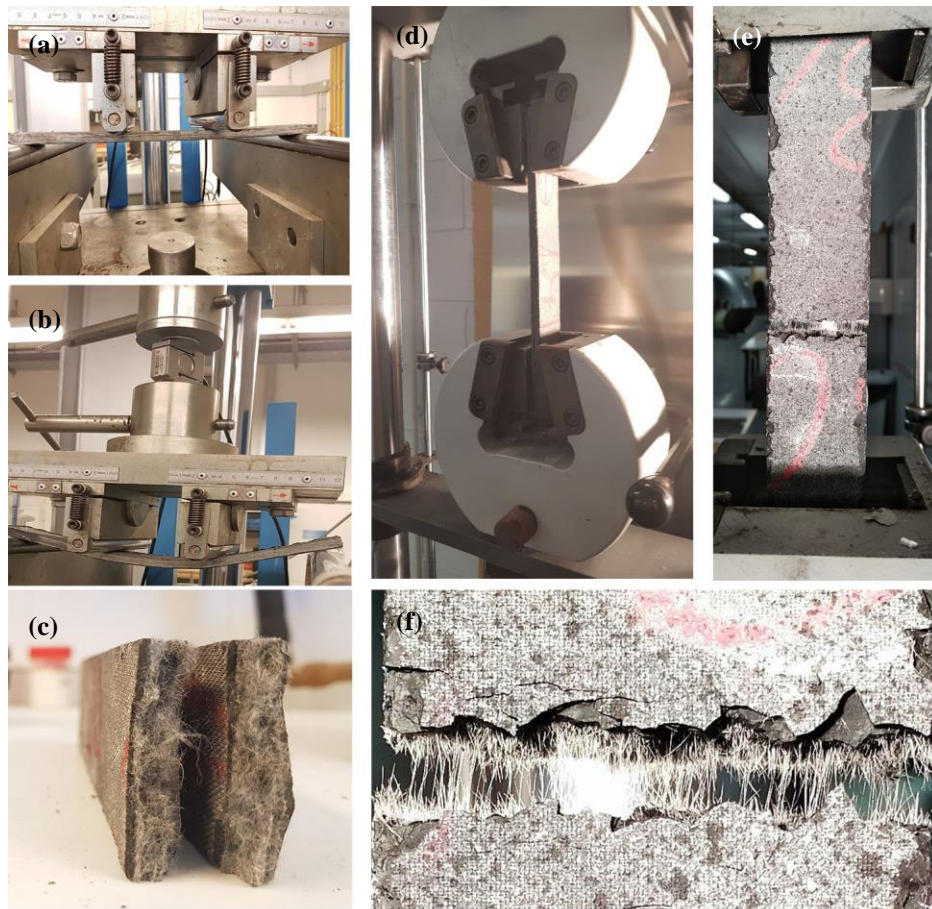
Mechanical tests on the composites: (a) flexural test set-up; (b) specimens under flexural loading; (c) flexural failure surface; (d) tensile test set-up; (e) rupture of the specimen under tension; (f) tensile failure surface .
